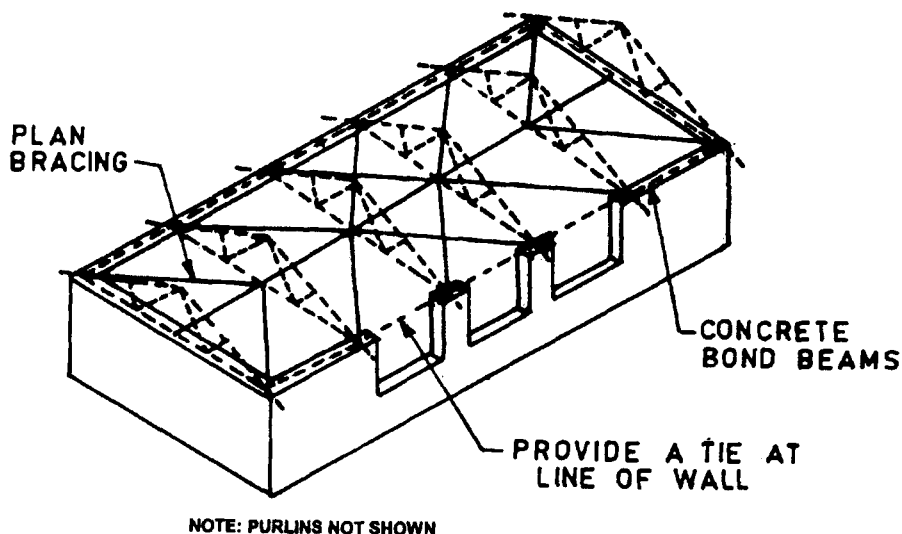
WIND BRACING FOR ROOF TRUSSES
